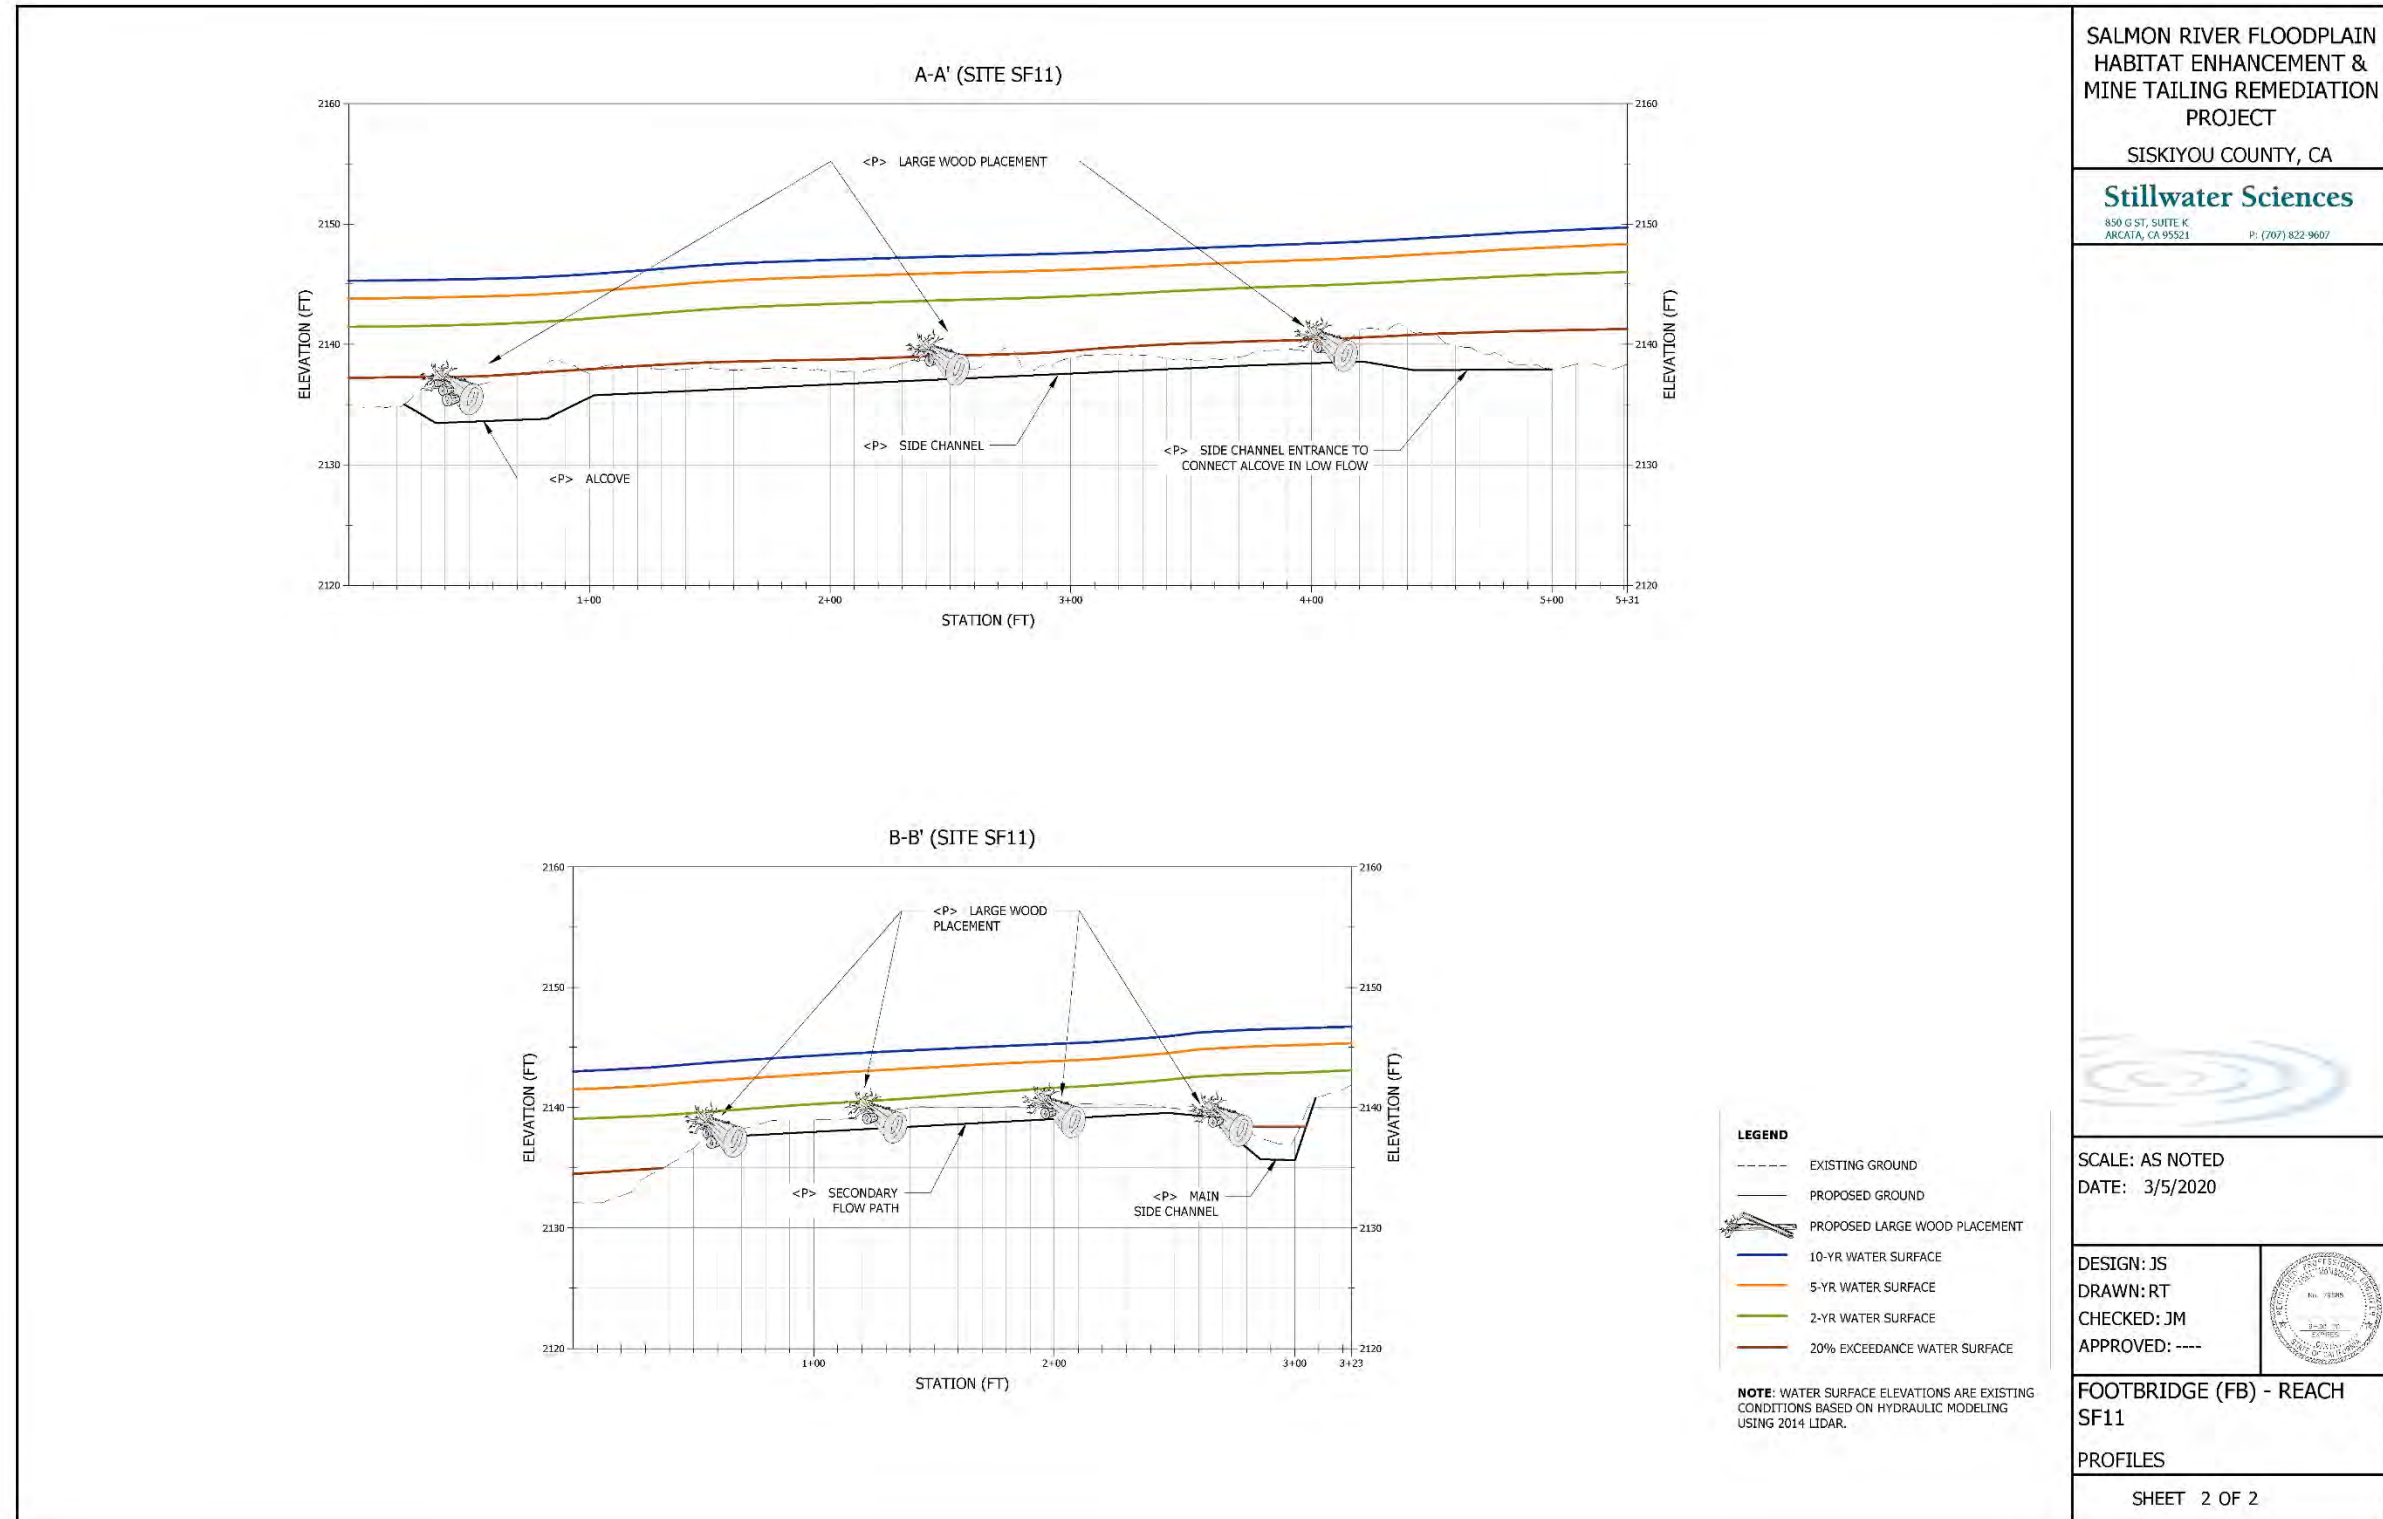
Design profiles for South Fork Reach 11 at Footbridge.
